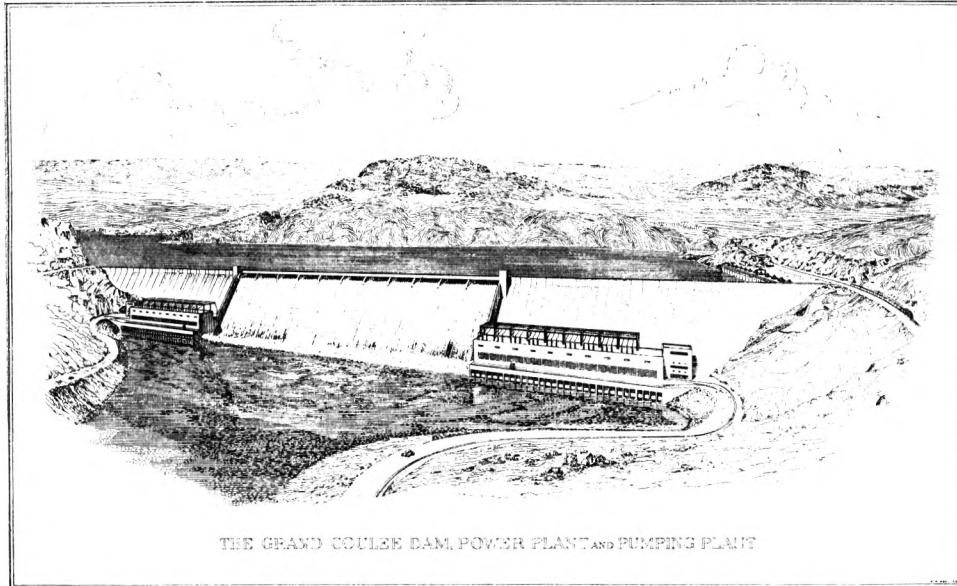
GENERAL ARRANGEMENT OF GRAND COULEE DAM, POWER PLANT, AND PUMPING UNIT
